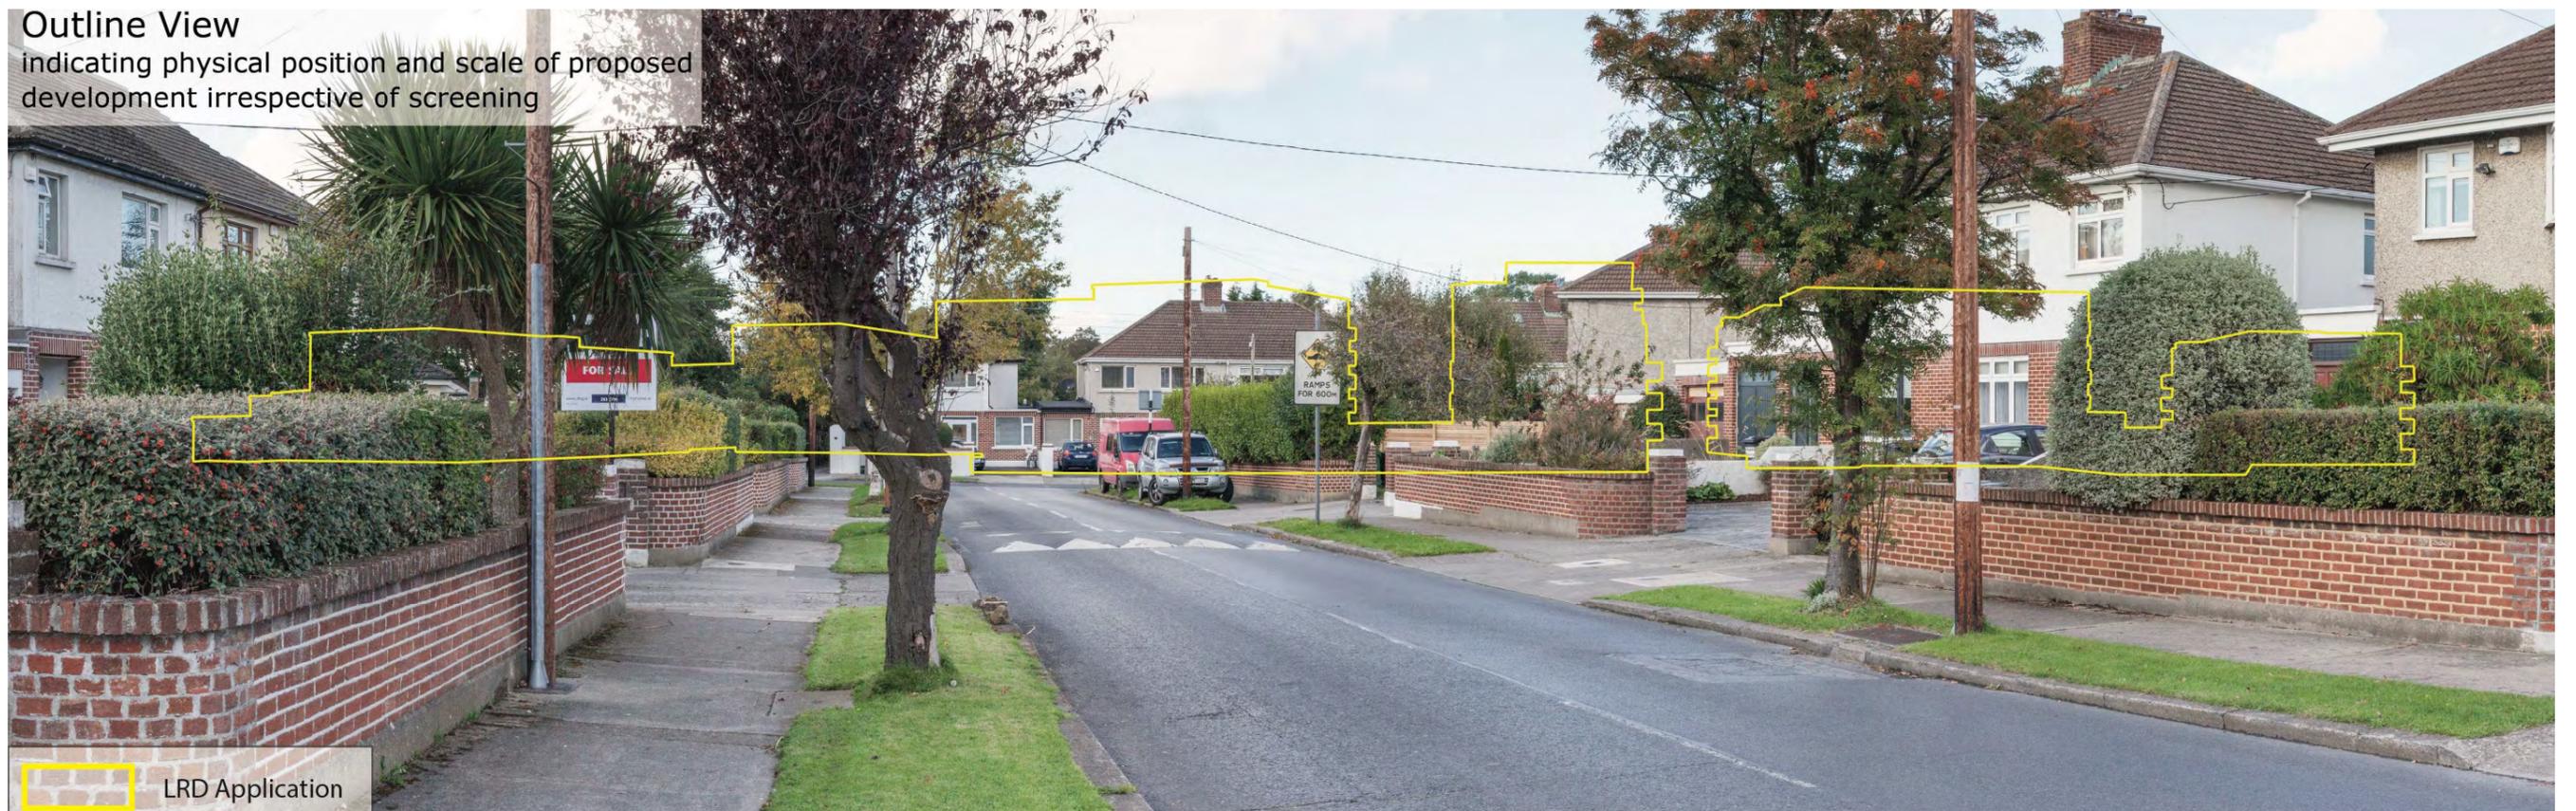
Proposed view towards site from Mount Carmel Road (VP3)
